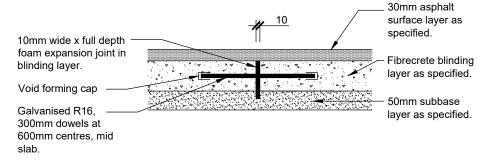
Typical Isolation Joint Detail _Secondary Granite
